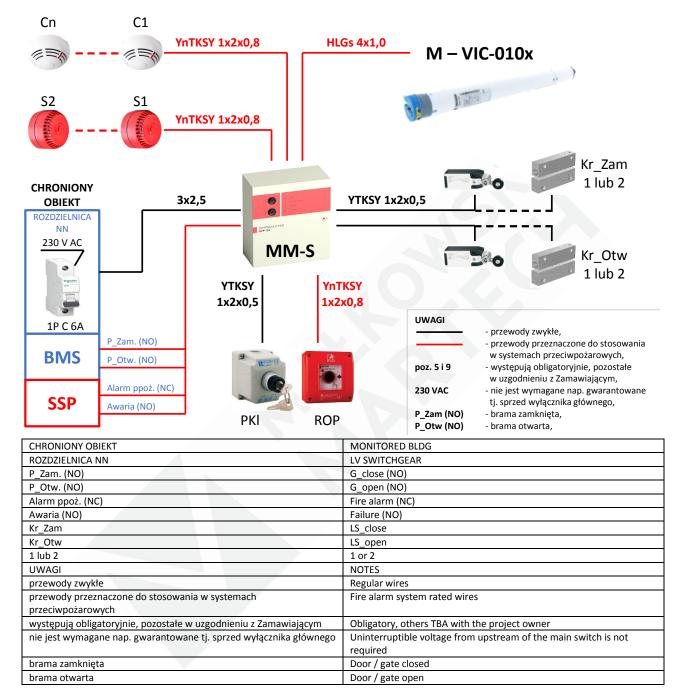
MARC-O control system with internal (tubular) 24 V DC drive unit
